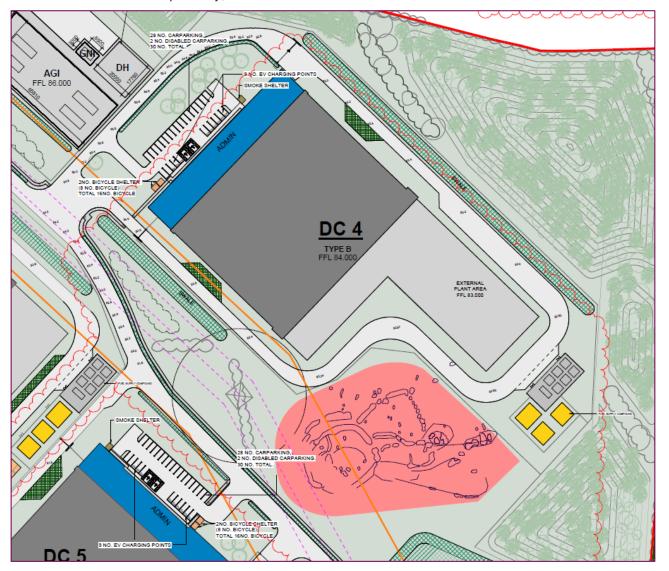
Amended Layout Illustrating DC4 Layout with Geophys Data Overlay (extract of now submitted drawing 22217-RKD-ZZ-ZZ-DR-A-1012-PROPOSED SITE PLAN B)
